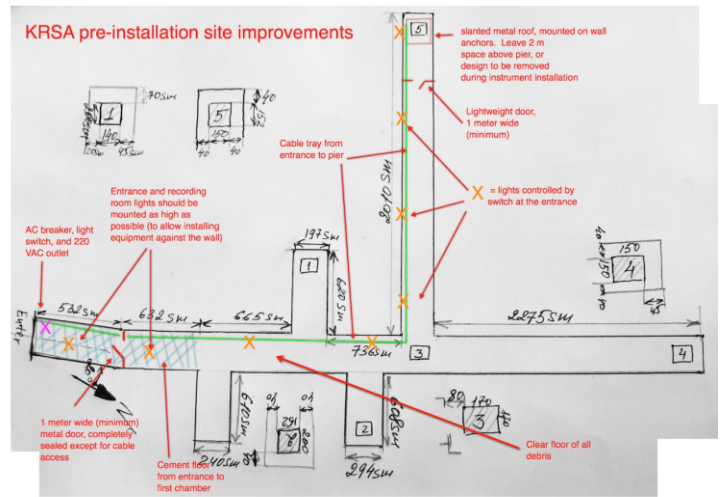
Schematic of existing tunnel layout with suggested improvements.
